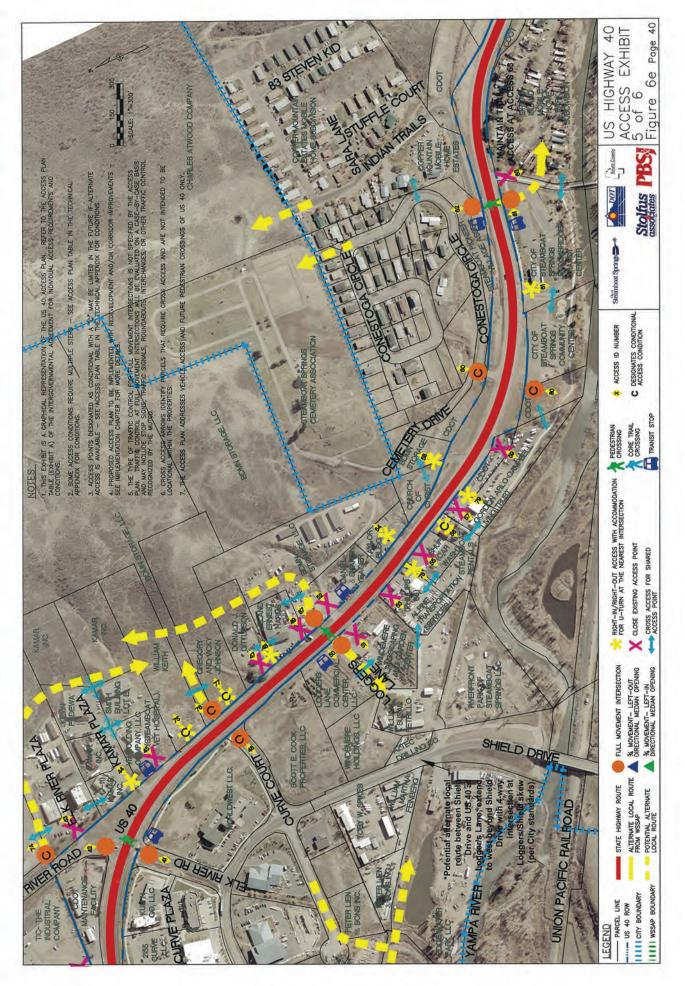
EXHIBIT A ACCESS CONTROL PLAN US HIGHWAY 40 MILEPOST 126.83 TO MILEPOST 131.90 May 6, 2008
